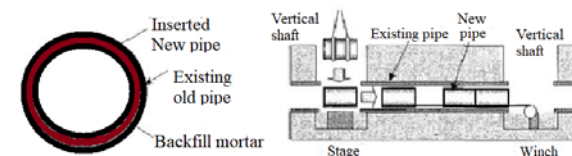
Image example of the method of inserting new steel pipe (Pipe in pipe) (800mm or more)
